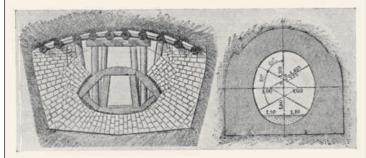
By filling in the excavated space with stone, leaving only a small pilot tunnel open in the centre, the Italian tunnellers finally succeeded in stabilizing the ground (left). The finished Cristina Tunnel is merely a small opening enclosed by a tremendous stone structure. But even this structure did not prove wholly stable and it became necessary to trim the sides to enable a train to squeeze through the tunnel.
